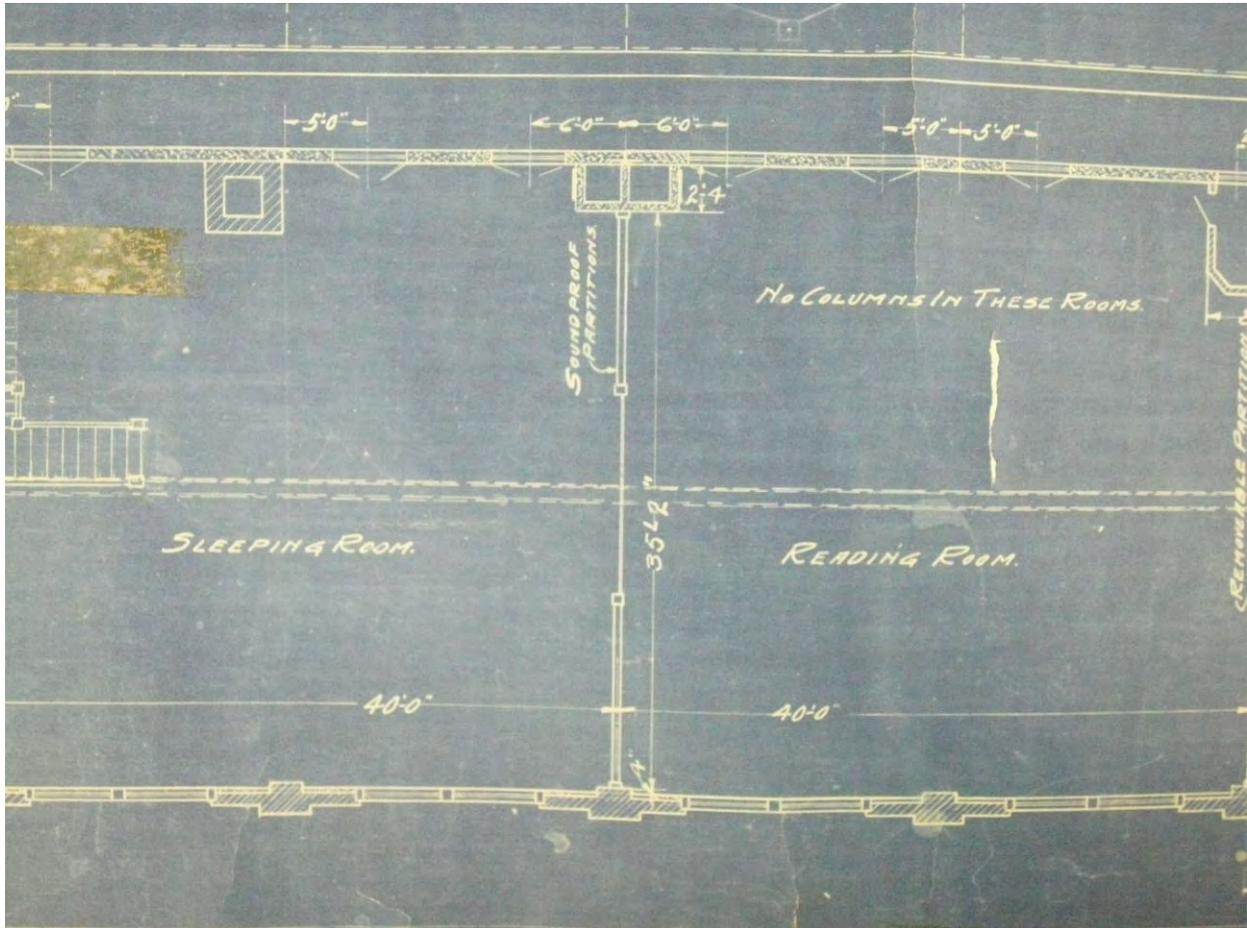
Second floor plan detail, sleeping room and reading room facilities for trainmen, source: Northwest Architectural Archives
